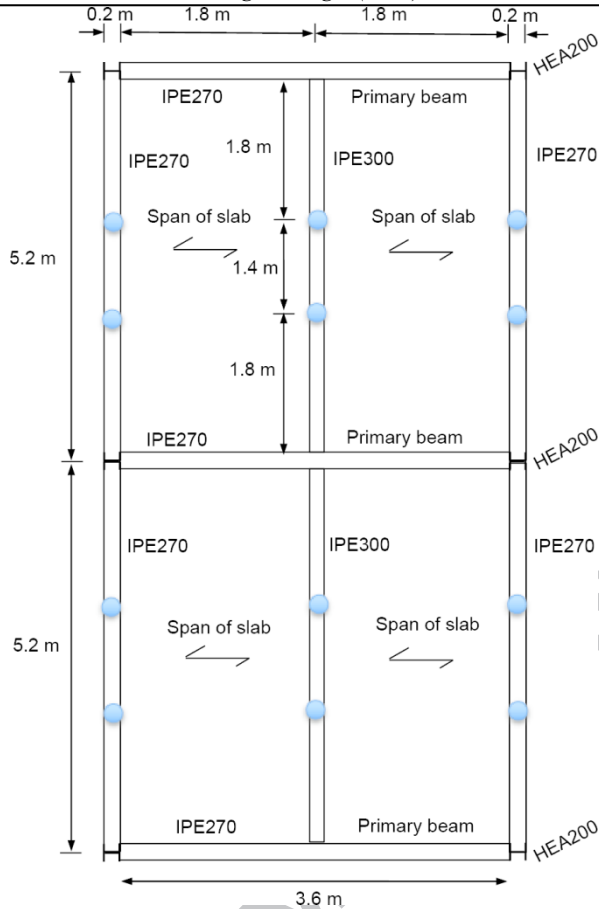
Beam arrangement and floor plate dimensions. The blue spots represent the point load applied to the internal beam (test 1) and the external beam (test 2). The load cells were placed under the central columns.
